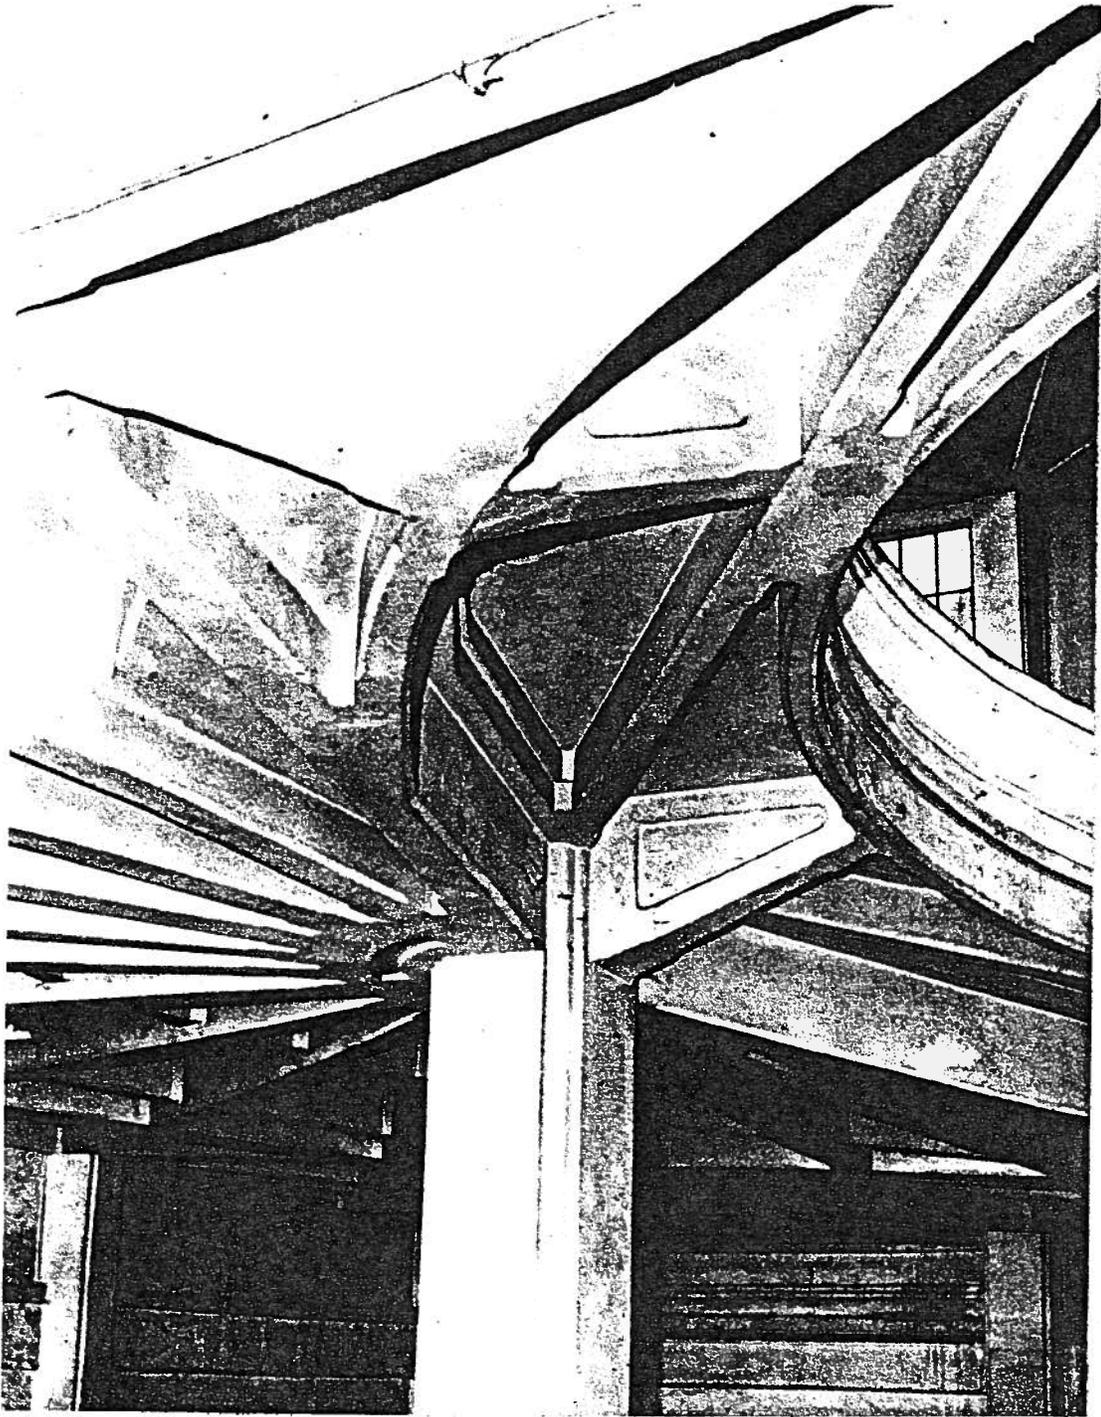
Detail of 1925 ramp pilaster with fanned beams at Lingotto.
